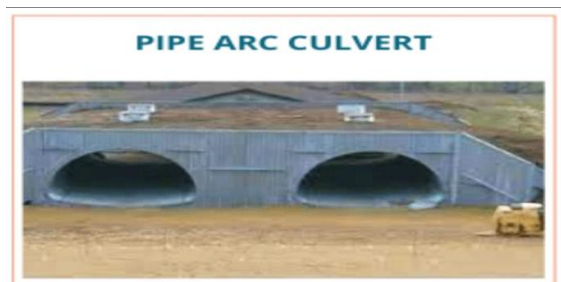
Pipe Arch Culvert (Civil Engineering, 2023) Fig. 4 Arch Culvert (ArchExpo, 2022)
